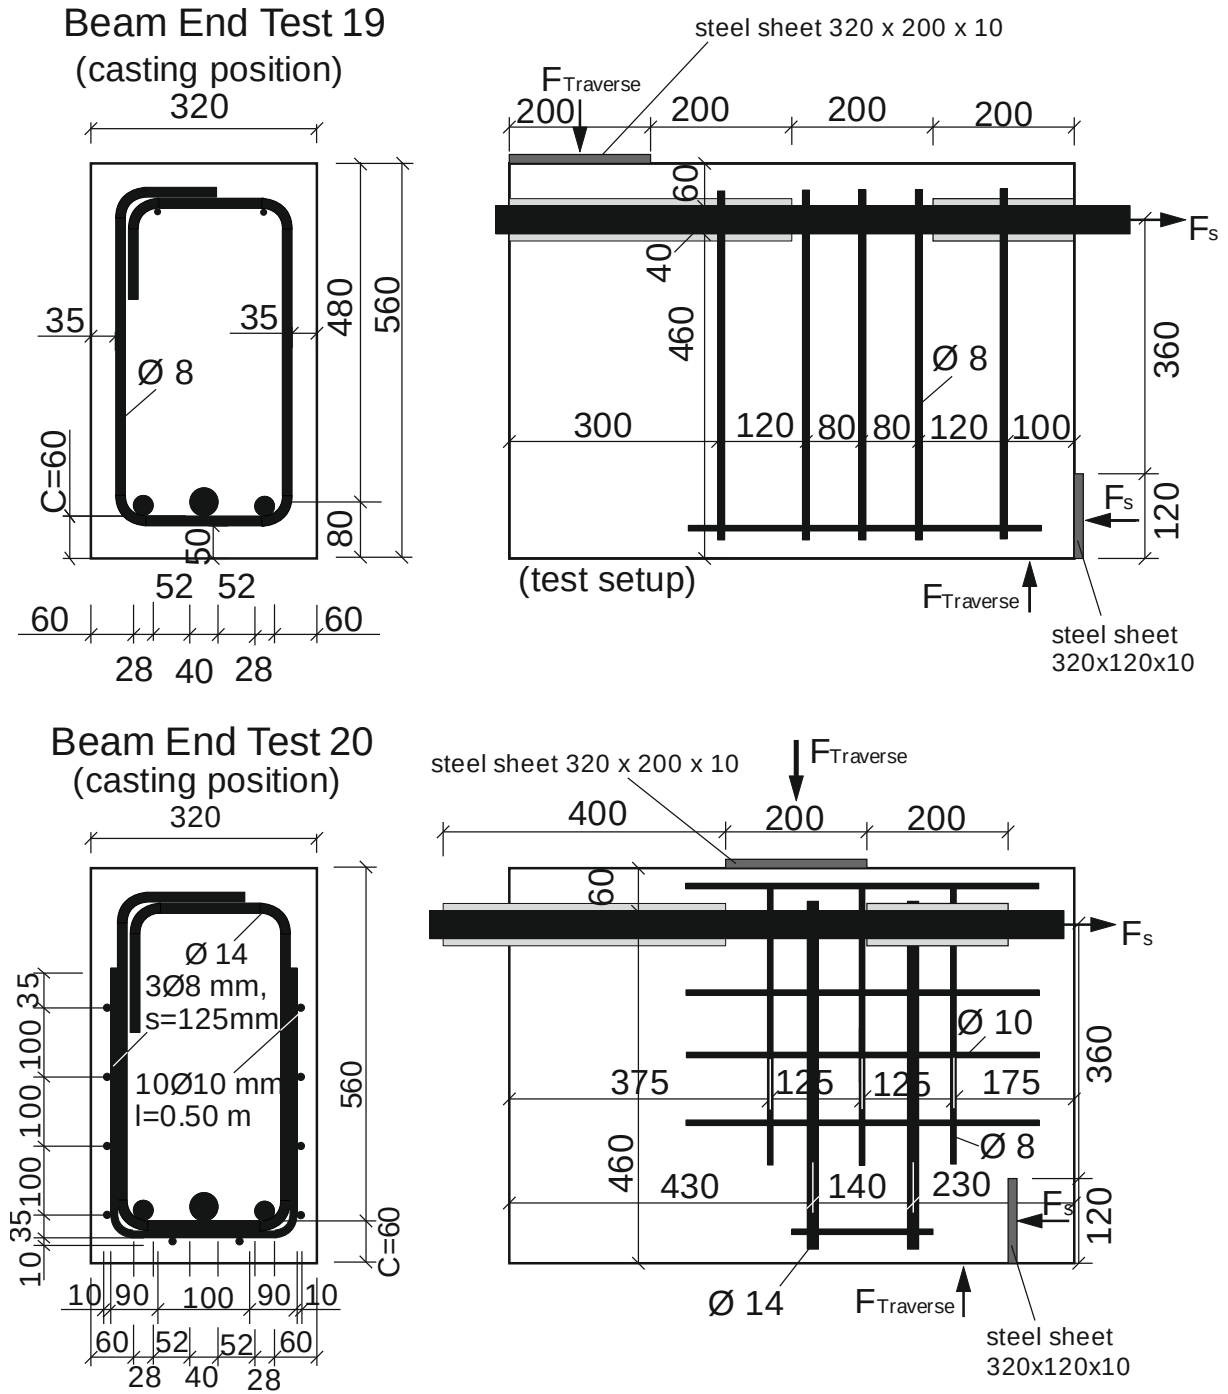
Reinforcement layout of Beam-End Tests 19 and 20
